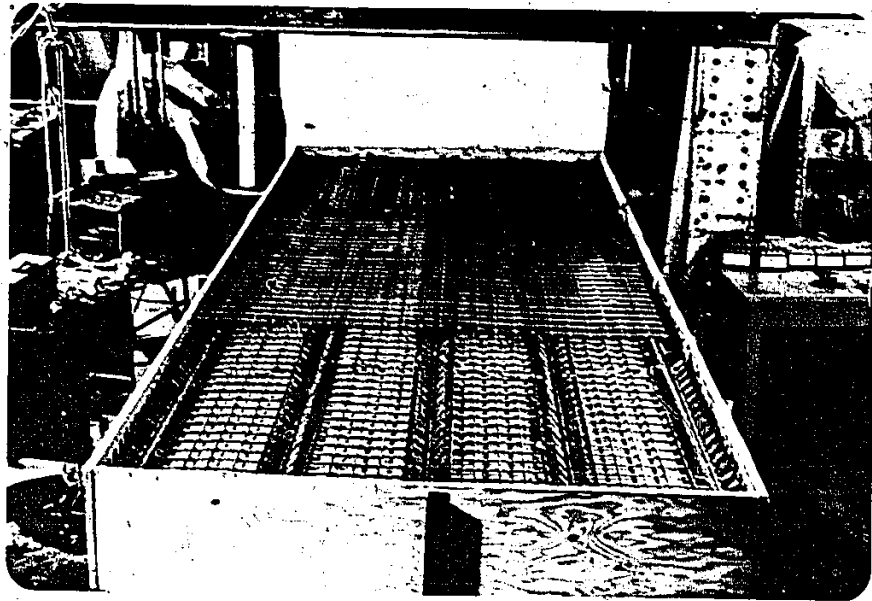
SLAB REINFORCEMENT LAYOUT AND THE FORMWORK, BRIDGE MODEL I.
